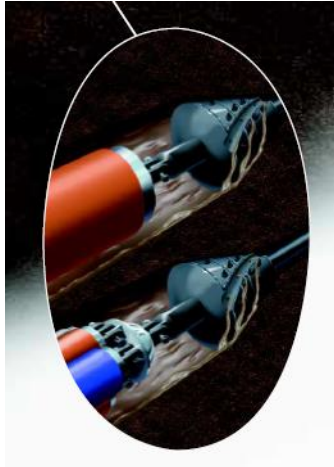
The drill head. It is flat and by rotating the direction of the drill head the pilot bore hole is usually reached as desired. (Vermeer. The NAVIGATOR Horizontal Directional Drilling Process)
